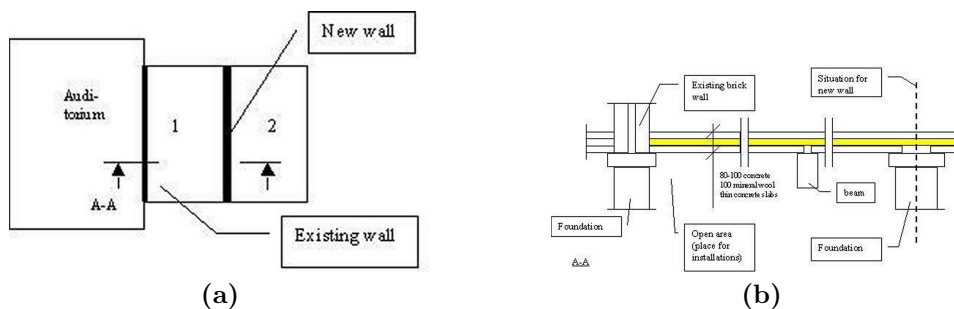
Lay out and existing building constructions; 1. new musical classroom; 2. ordinary classroom.
